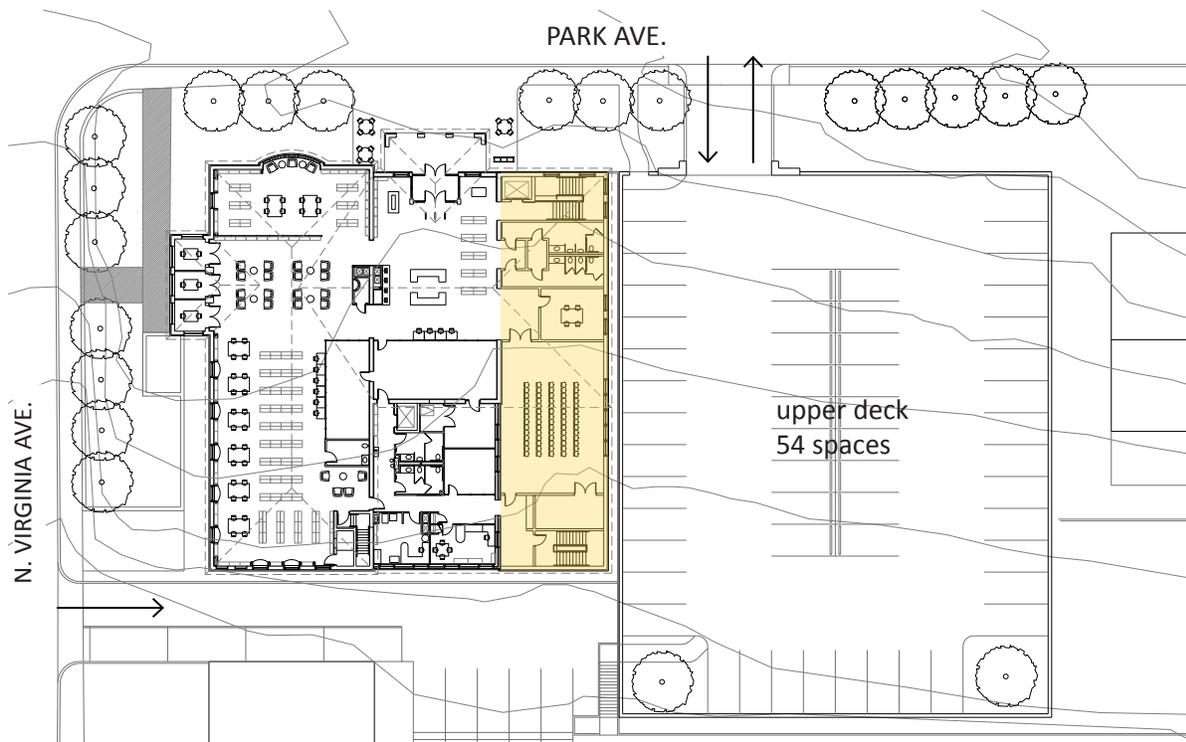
East Expansion Main Level Plan + Parking Deck
